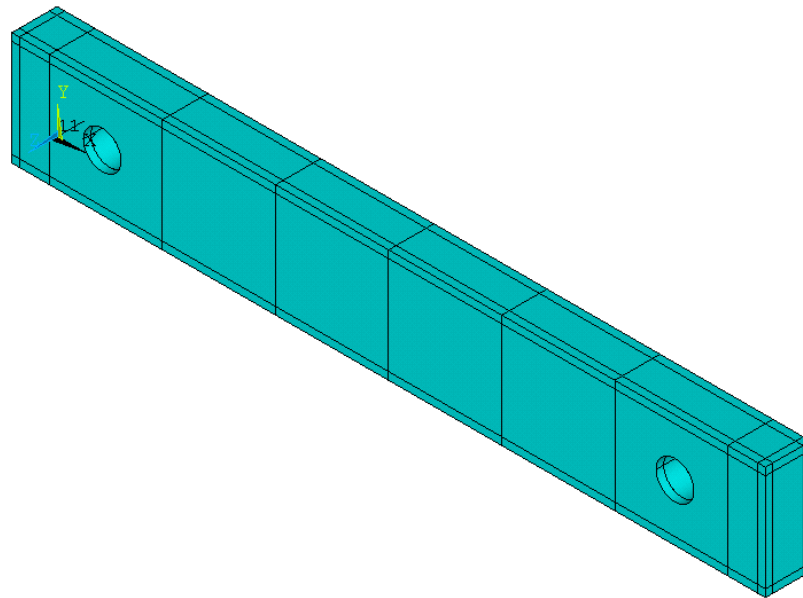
Model of Reinforced concrete beam with 100mm circular opening
